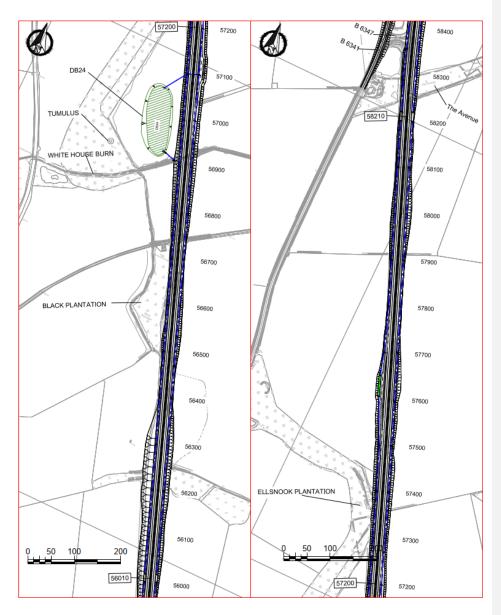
Highway Drainage Layout and Detention Basin DB24
